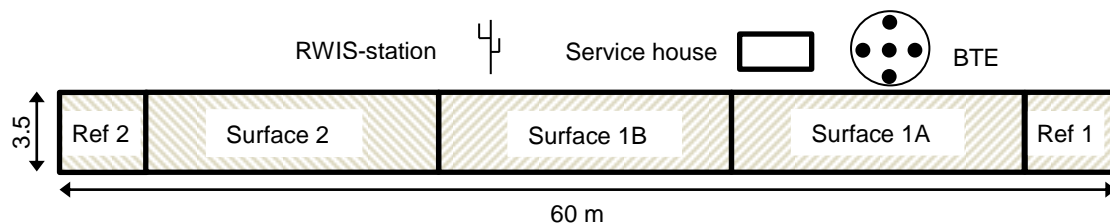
Principal layout of the planned test site outside Östersund. on the performance of a hydronic pavement system.
